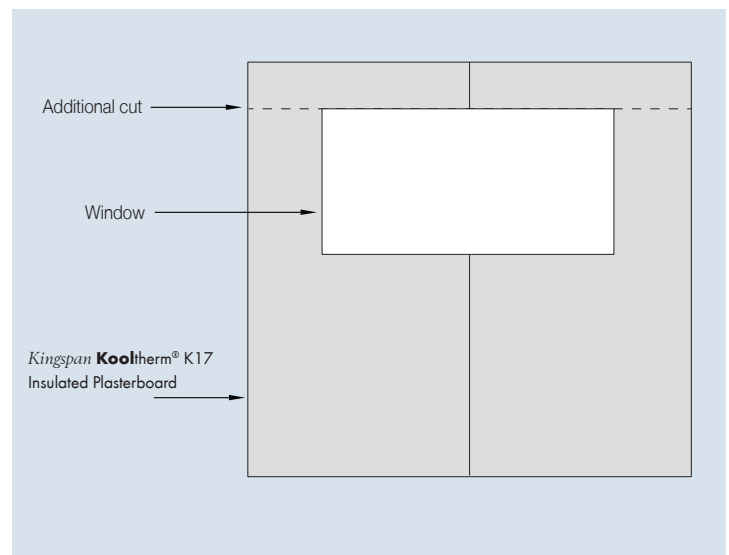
Kingspan Kooltherm*® K17 Insulated Plasterboard Installation Details for cutting
